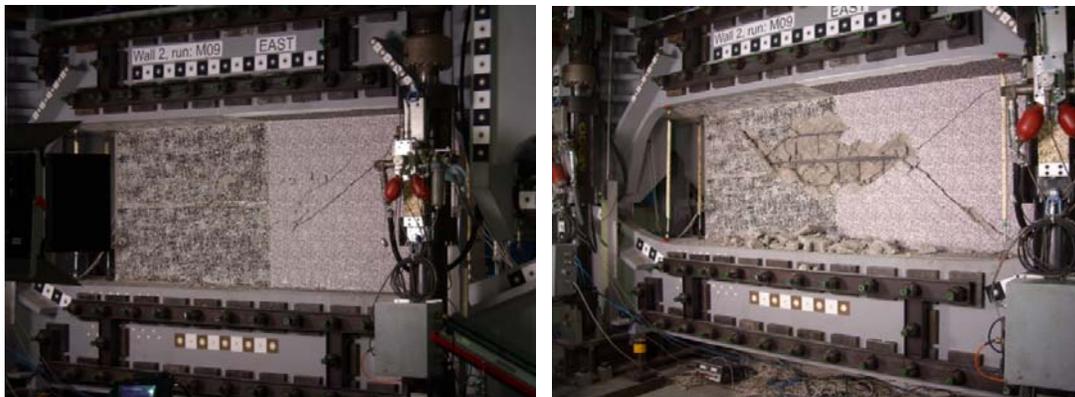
, 2 The reinforced concrete shear wall testing at the ELSA laboratory (IRIS project)
